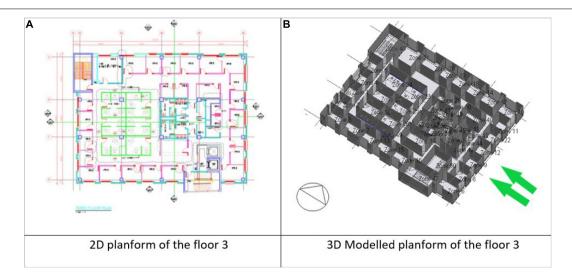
| 2D and 3D planforms of the floor 3 in the ACK building. (A) 2D planform. (B) 3D modelled planform (Sedaghat et al., 2021).
